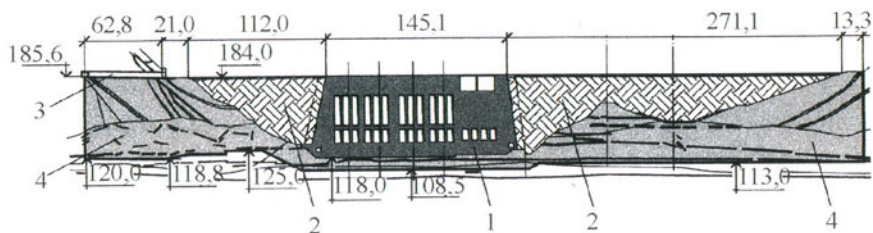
Longitudinal section of structures of the Svetlinskaya HPP head front. 1—power house combined with the spillway; 2—earth-and-rock-fill dams; 3—grouting galleries; 4—grout curtain
